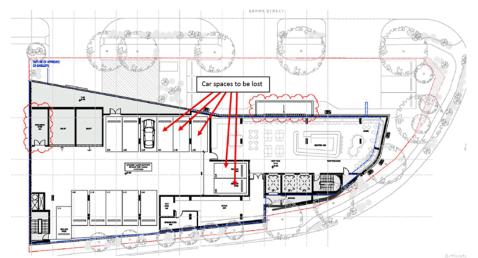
Approved Level 1 floor plan demonstrating the location of car spaces to be removed
